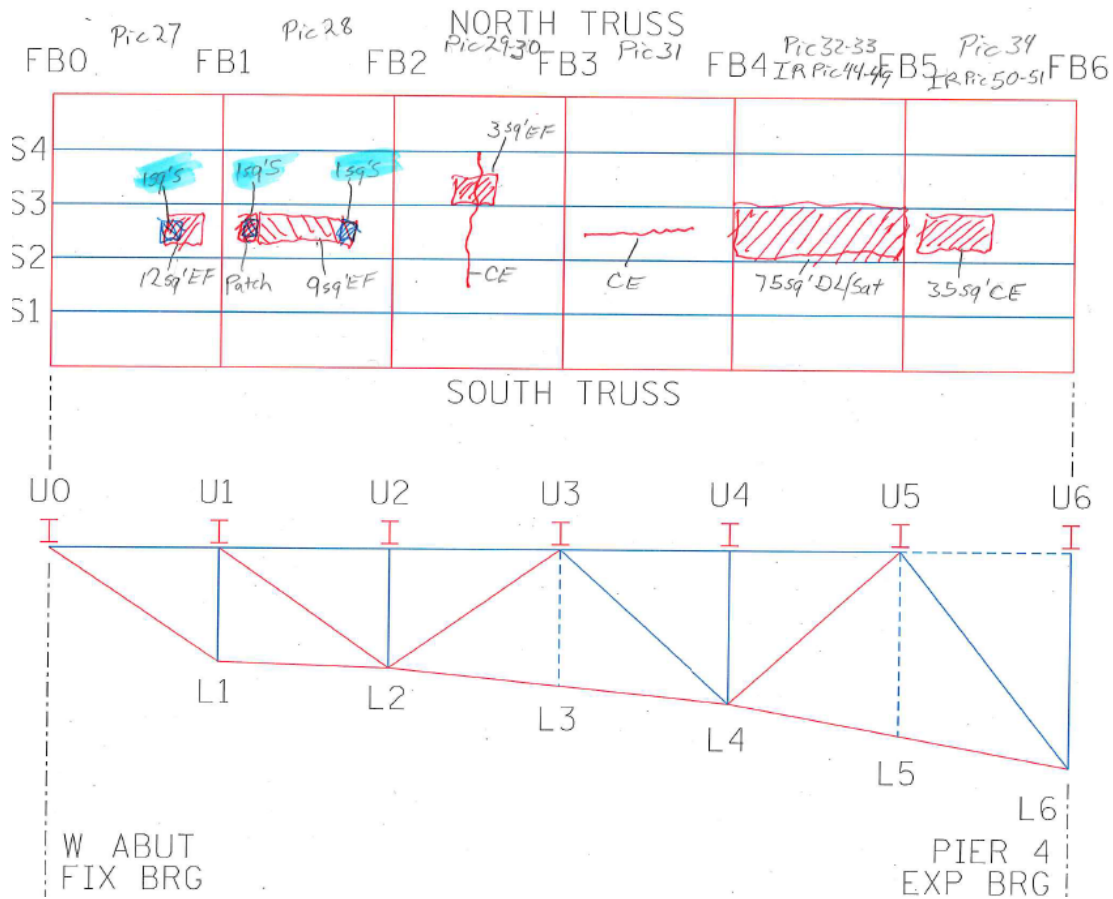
Underdeck and topside sounding performed in February 2017 (Span 1).
